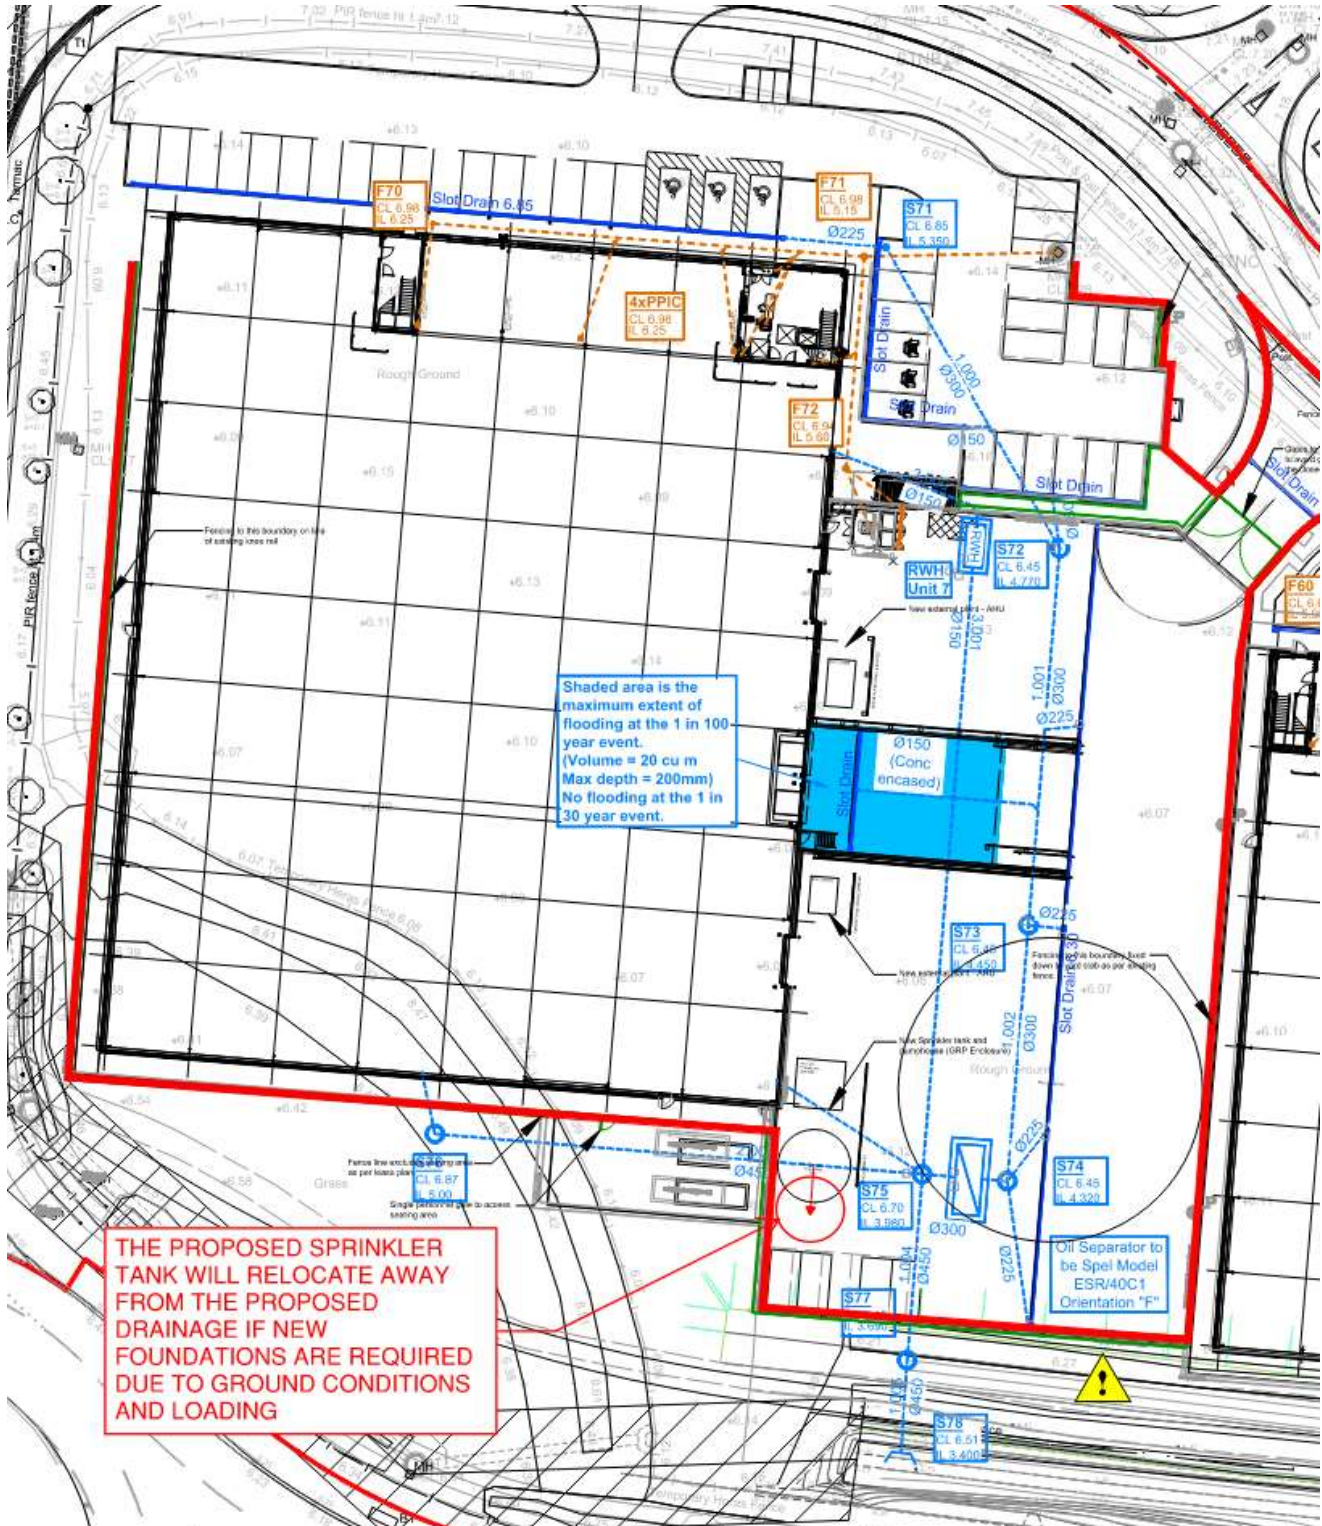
Existing Drainage Layout and Proposed Layout Overlain
